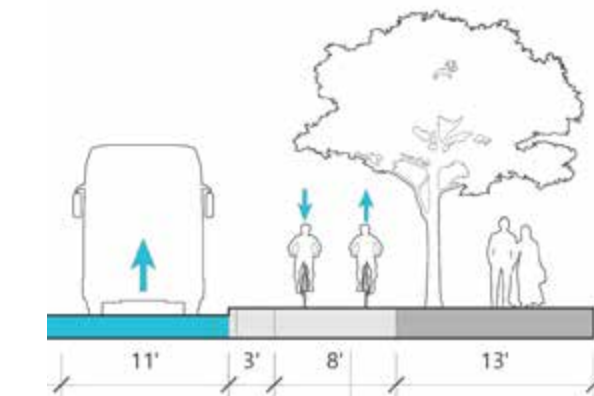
Bus on a Typical Arterial Street with a Two-Way, Sidewalk-Level Class IV Bikeway.
